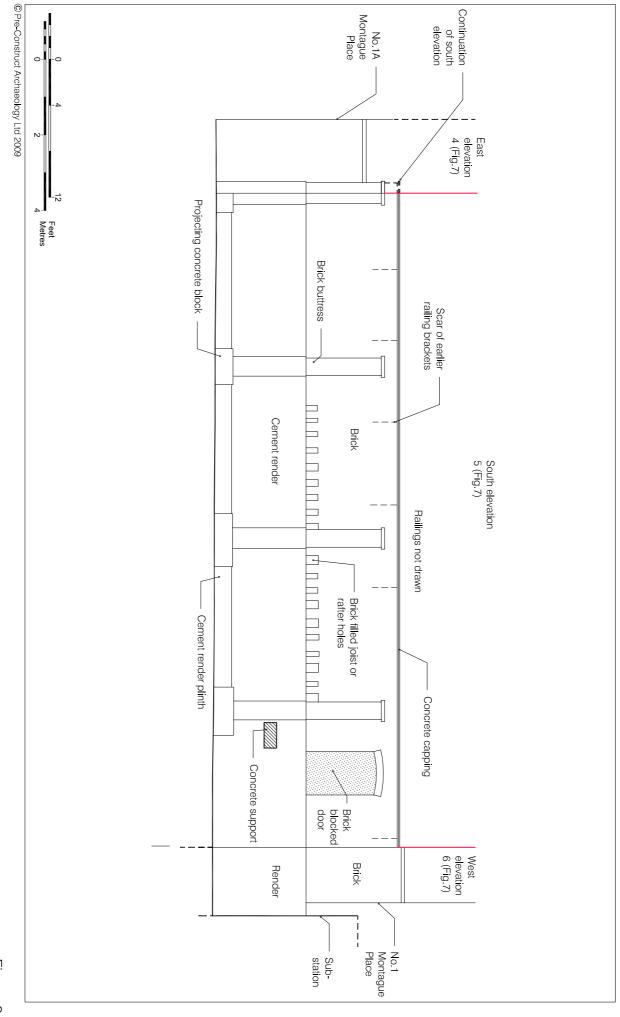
South, East and West Elevations Boundary Wall Montague Place, British Museum 1:100 at A4
